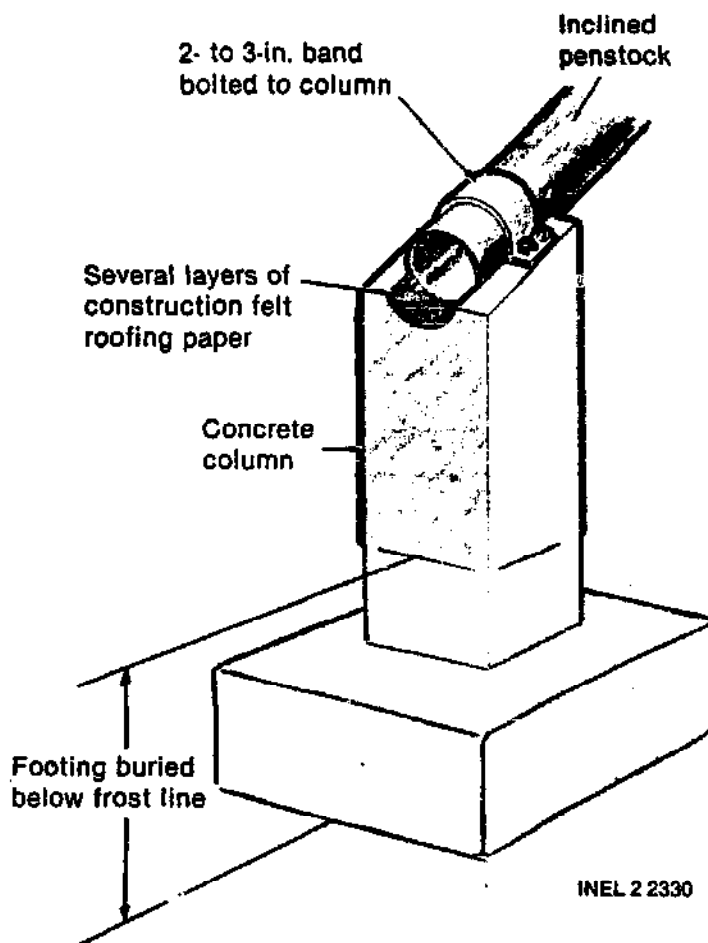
Typical concrete support saddle for above-ground piping.
